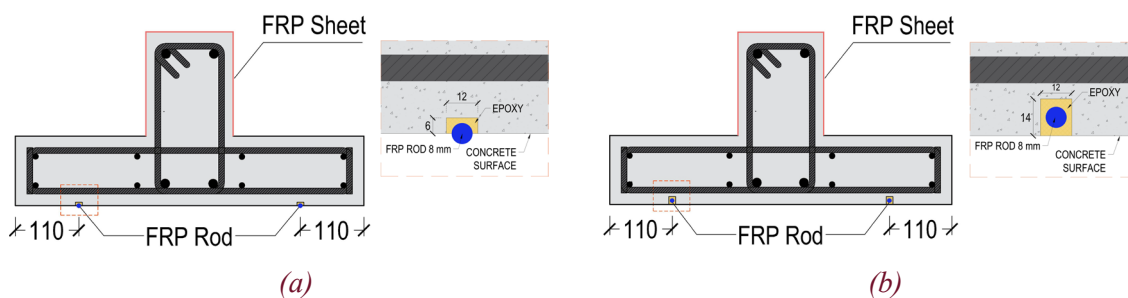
Strengthening configurations (unit: mm): (a) SB-H specimen, (b) SB-F specimen
